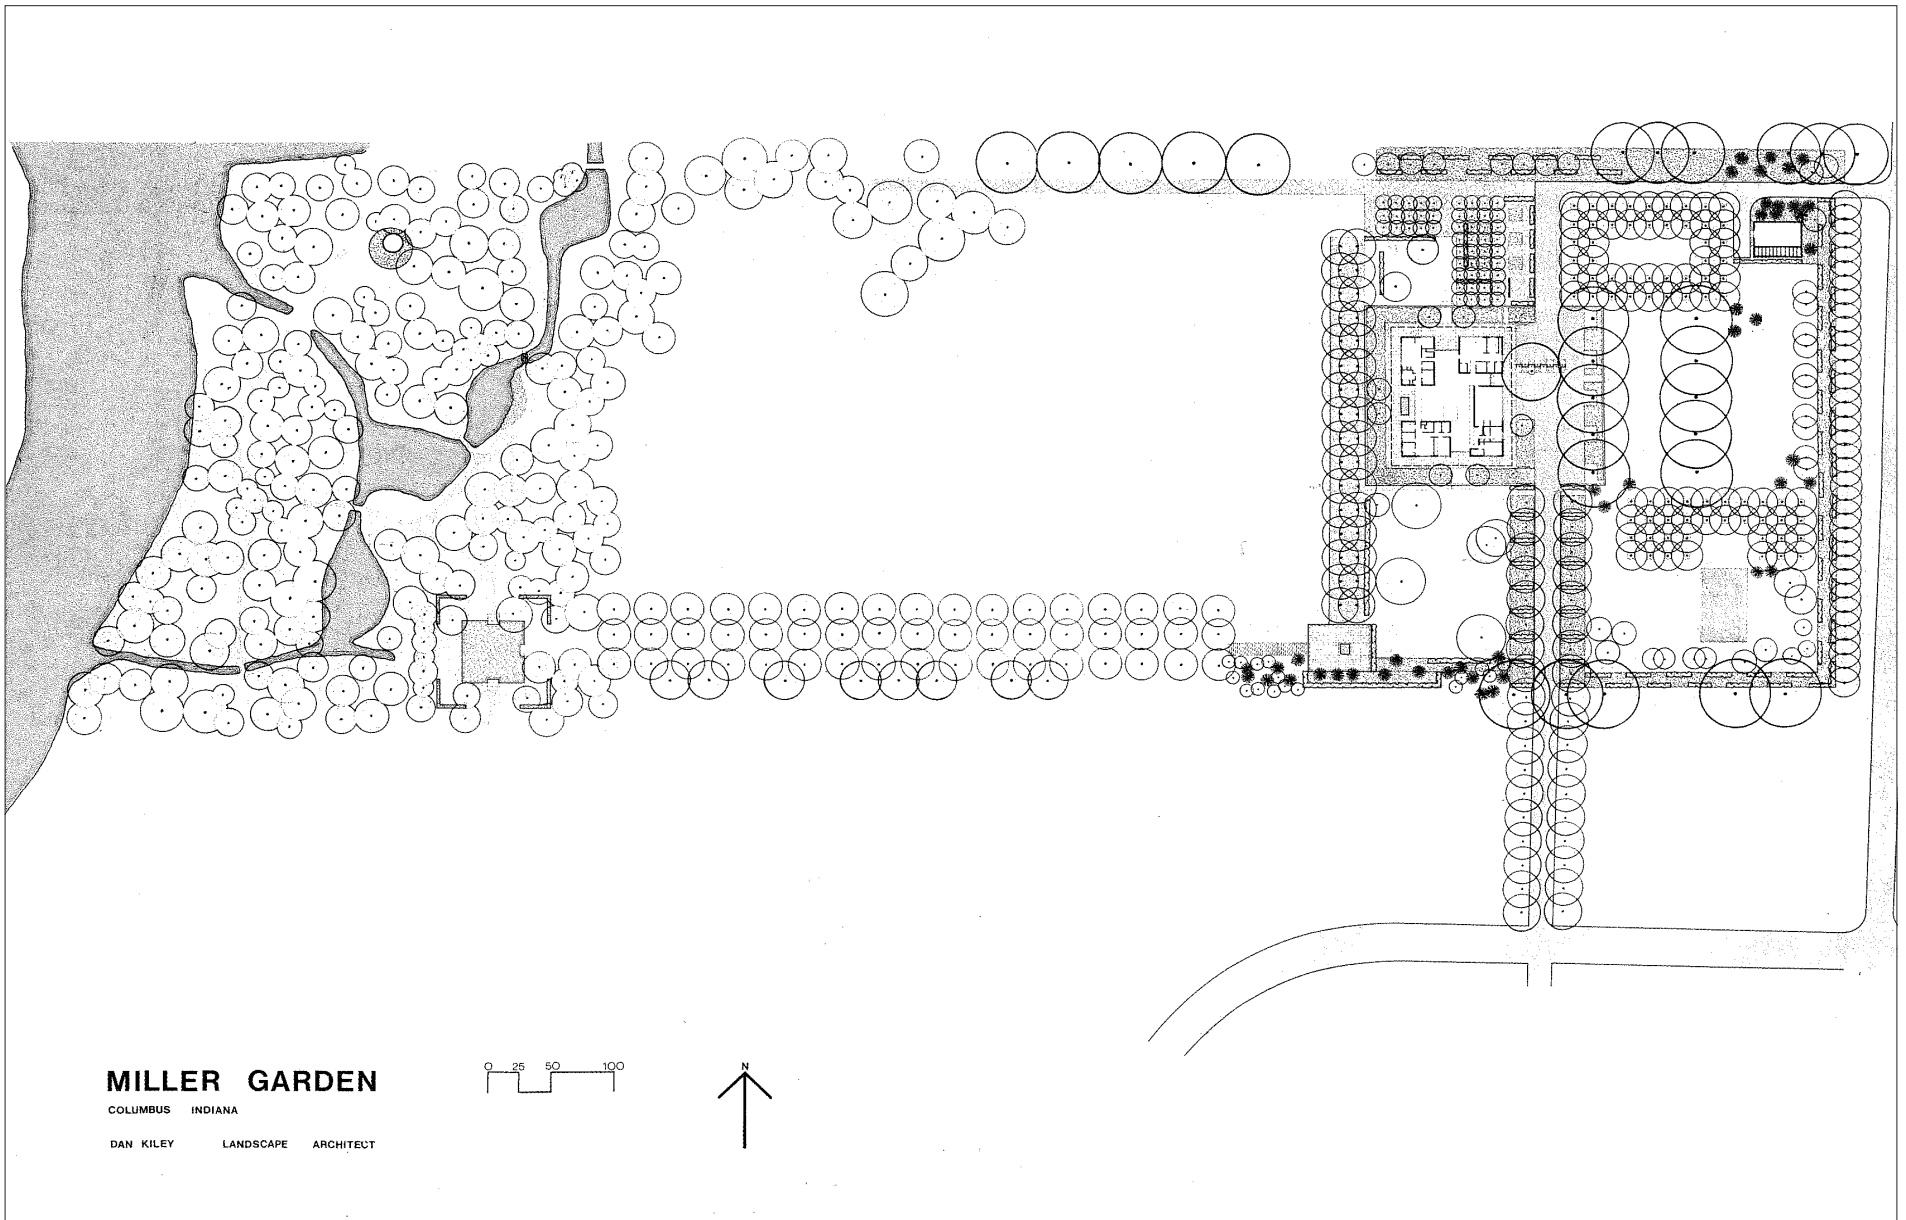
Kiley's final published plan of Miller House and Garden landscape. Date: 1957. Photo credit: Brooks 2011, endpapers; Miller House and Garden Collection (M003), Newfields Archives.
